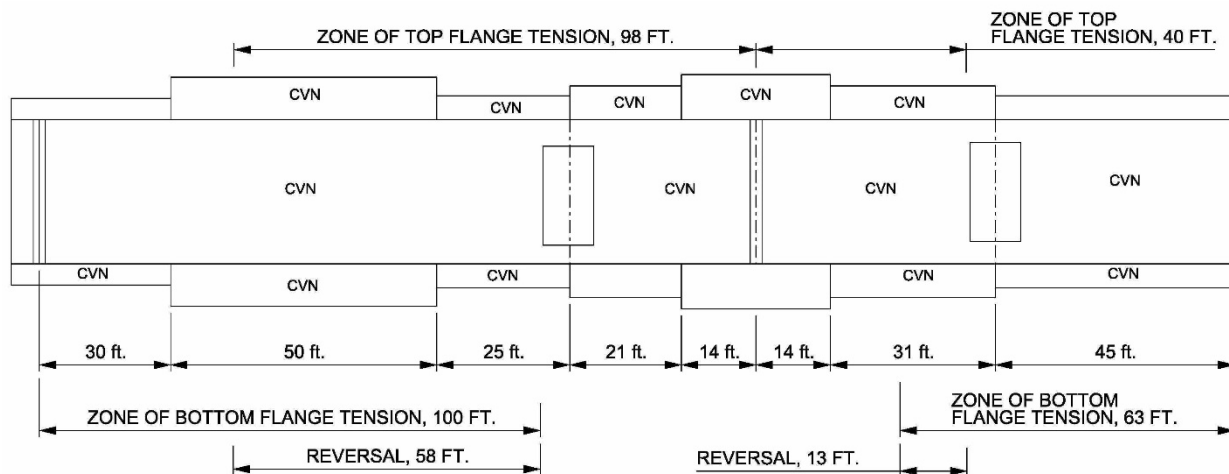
Tension zones and required CVN designation for a three-span continuous beam (only half of girder shown).
